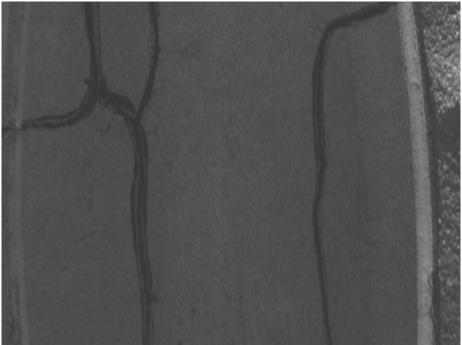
Longitudinal Cracks in Z 30 test section, Clinton County
